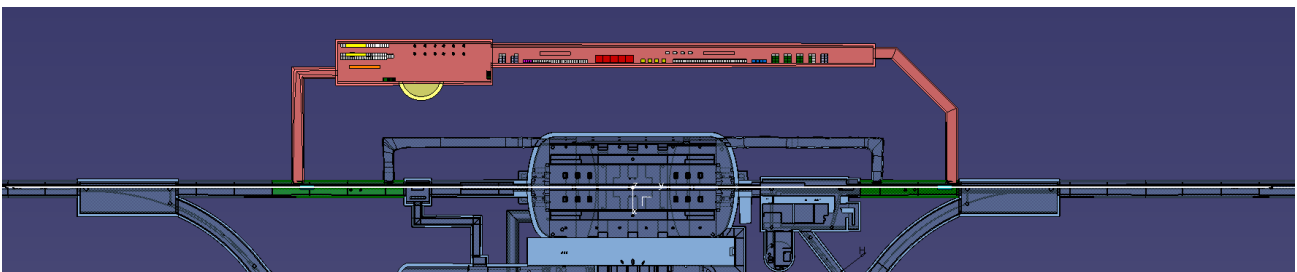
Possible option for underground work at P5 including links to the LHC tunnel. This solution has an independent shaft for access to the surface, and a larger connection tunnel for possible power converter underground installation. New structures are in light red and yellow, and zones of the LHC tunnel to be impacted by construction of the new structures are in green.
